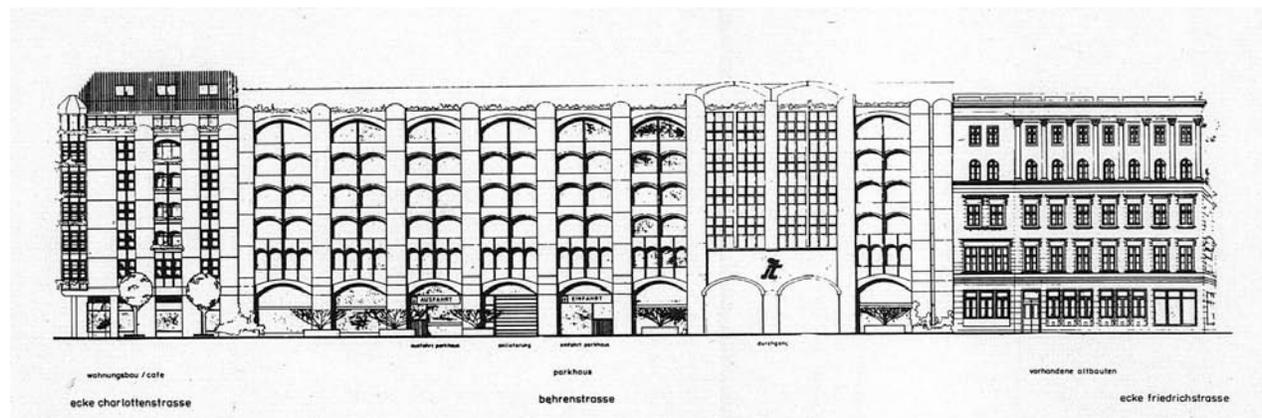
Friedrichstraße: Parking garage on Behrenstraße (middle)
